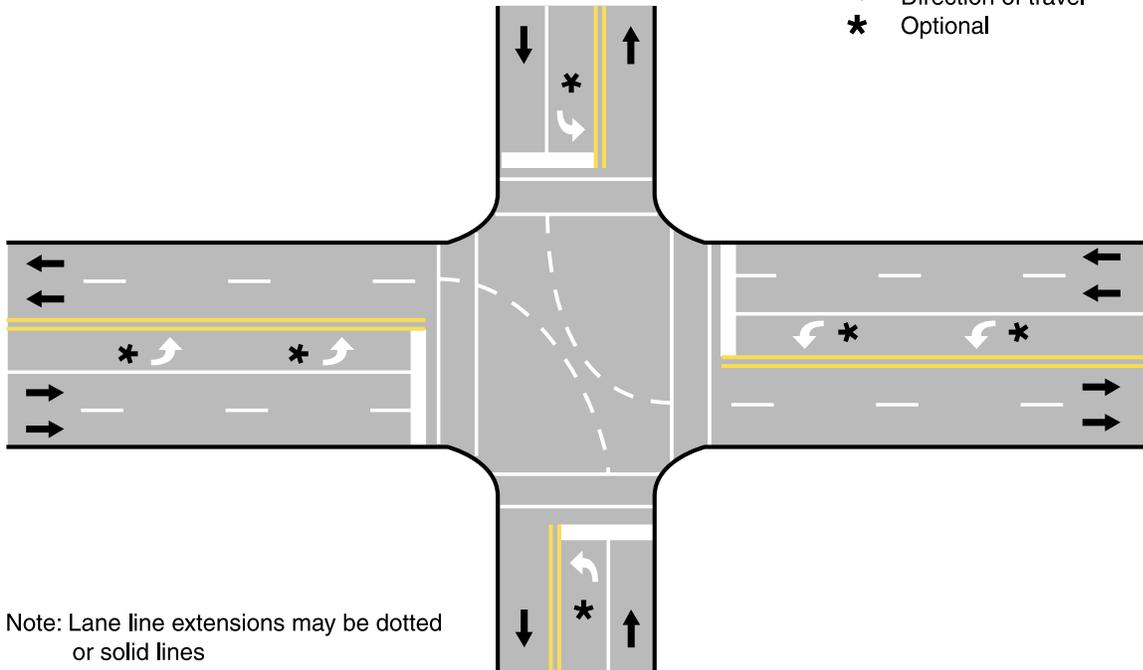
B-11. Typical Pavement Marking Applications (Sheet 2 of 2)
